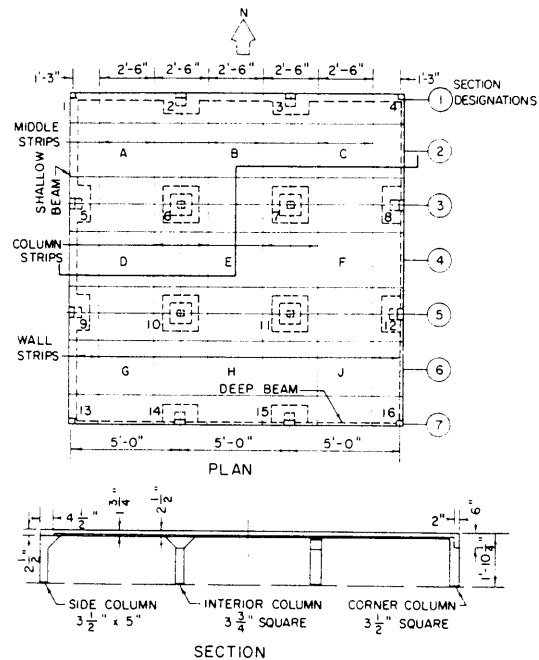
PLAN AND SECTION OF TEST STRUCTURE F3
